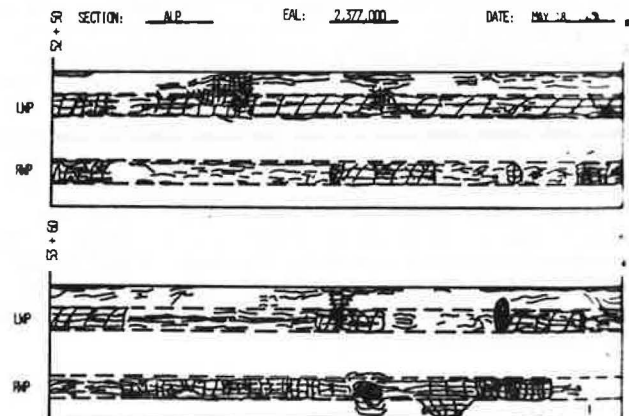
Crack patterns in crushed-stone pavement.
